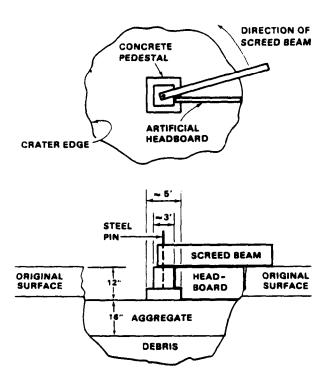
CONCRETE CAP USING PEDESTAL
